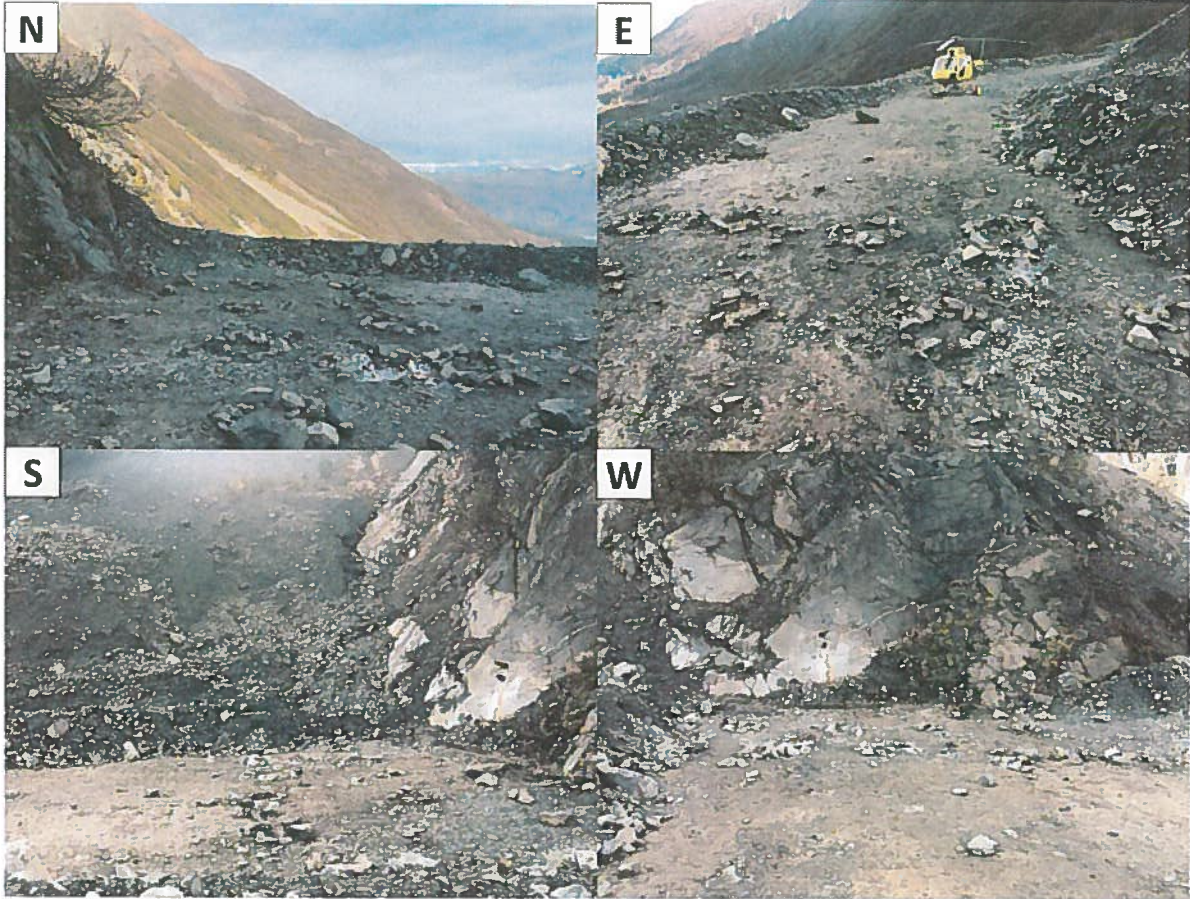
Wormhole Drill Pad post-drill reclaimed. Drill pad was both built and fully reclaimed in 2022.
